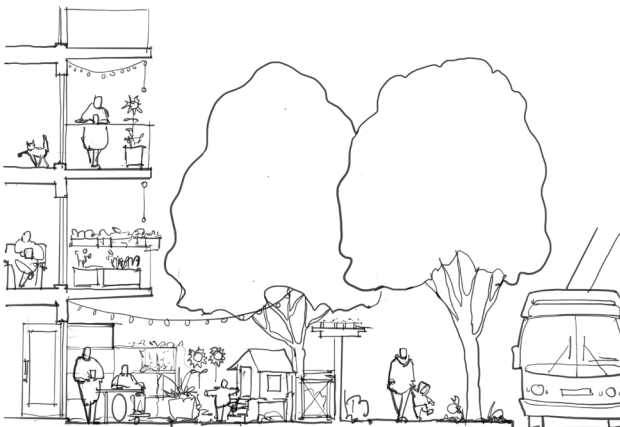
Locate height and shape buildings to minimize shadowing on parks, open spaces and shopping streets
